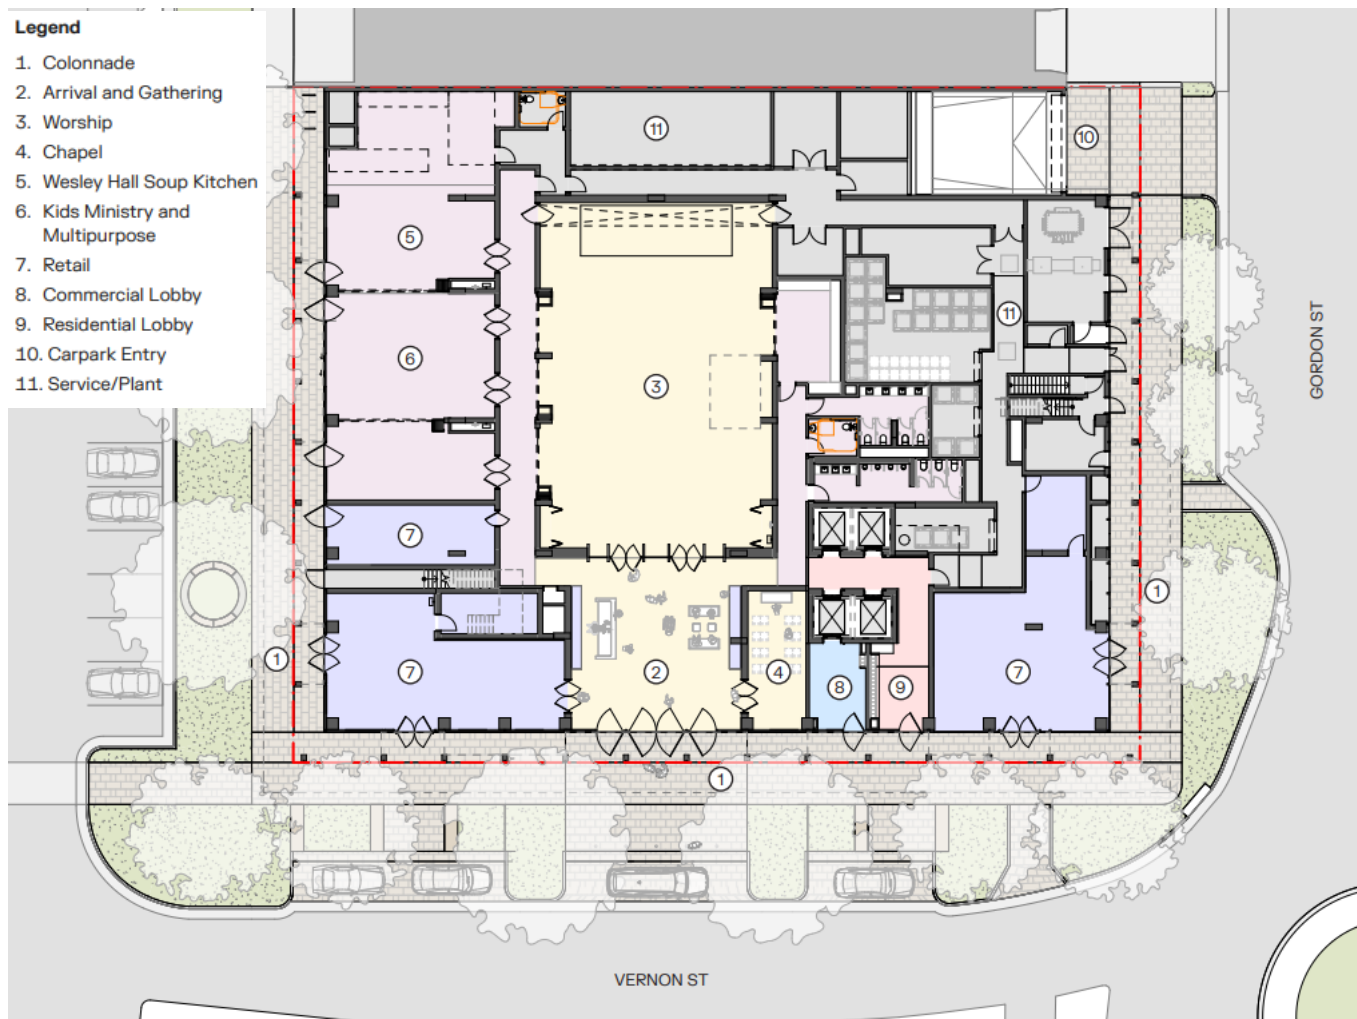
Excerpt of ground-floor plan illustrating the ground plane
